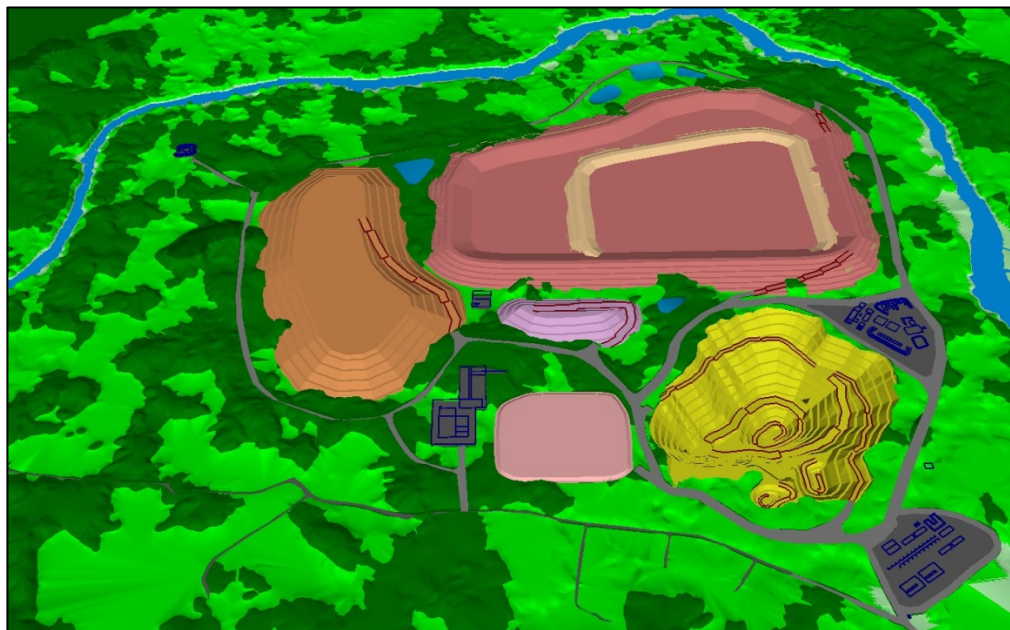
Jugan: 3D View of Pit, TSF, Waste Landform & Mine Infrastructure
